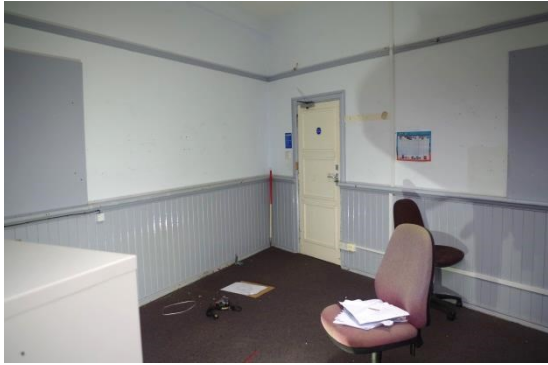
Quadrangle: example of wall panelling, dado and picture rails in room 18 looking east.
